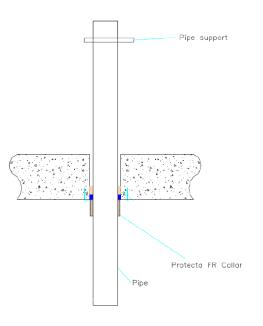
General arrangement of plastic pipes penetrating a 150mm thick concrete slab protected with Protecta FR Collar installed at the exposed side
